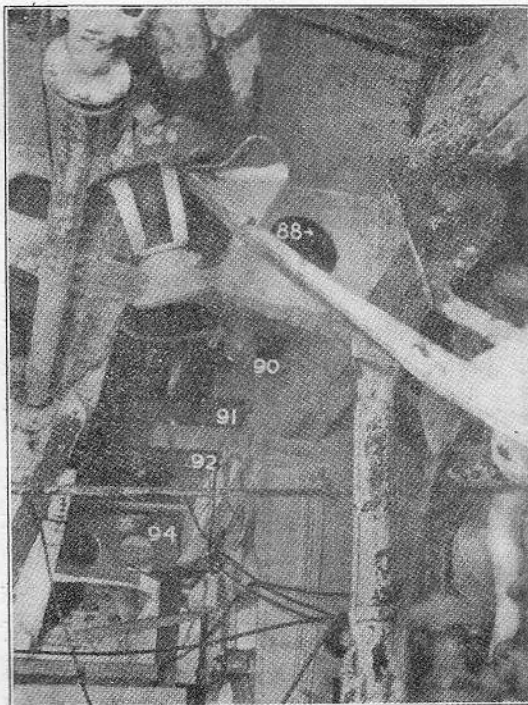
Sagging Test. Details of Failure Characteristics of Starboard Intermediate and Outboard Deck Girders, Frames 86-88, looking aft.
